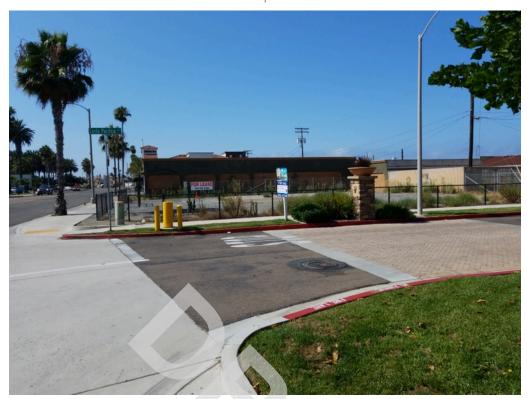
View of the Site from the intersection of Costa Pacifica Way and N. Coast Highway, looking southwest.
